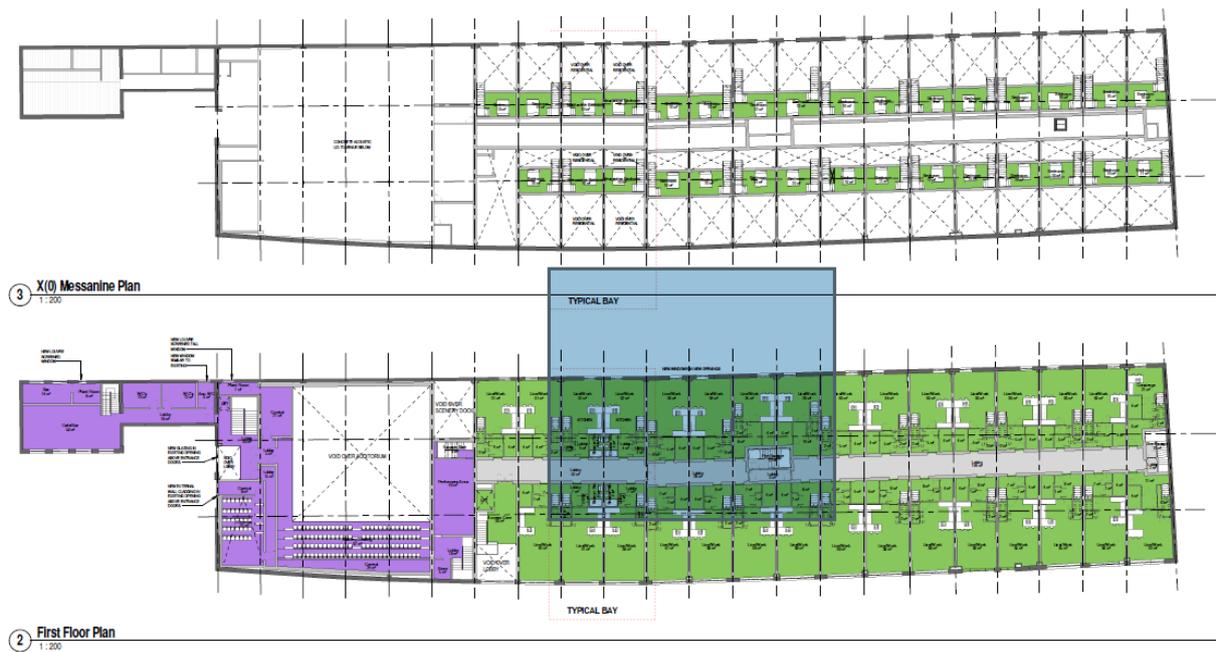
The first floor and mezzanine floor plans demonstrate the proximity of the live/work residential units to the performance and arts hall.
